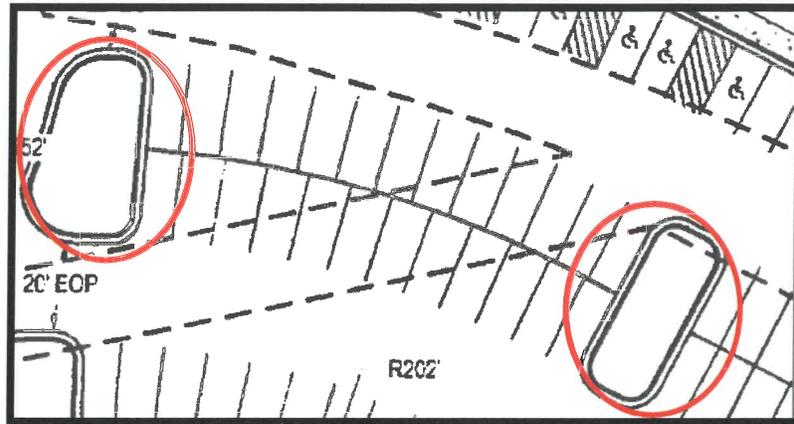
Double Row, Head-to-Head Parking, 26 spaces
